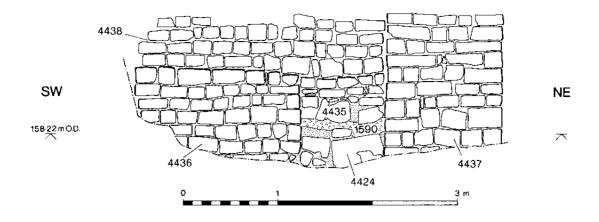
Elevation E: Exterior elevation of the south-east wall of the north-west angle tower
